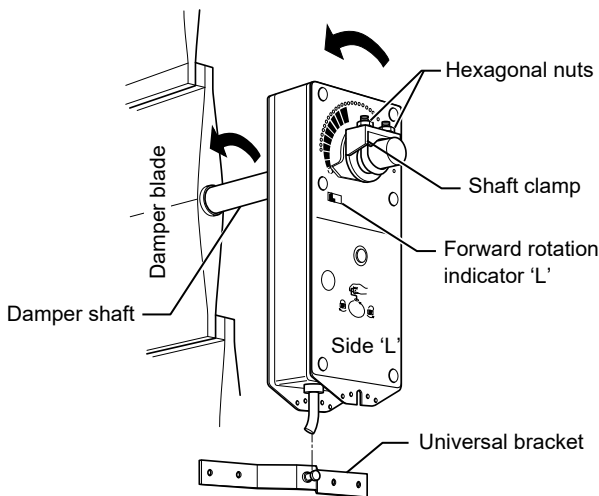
Installation of the actuator with forward rotation to min. 95 mm long shaft (1)
